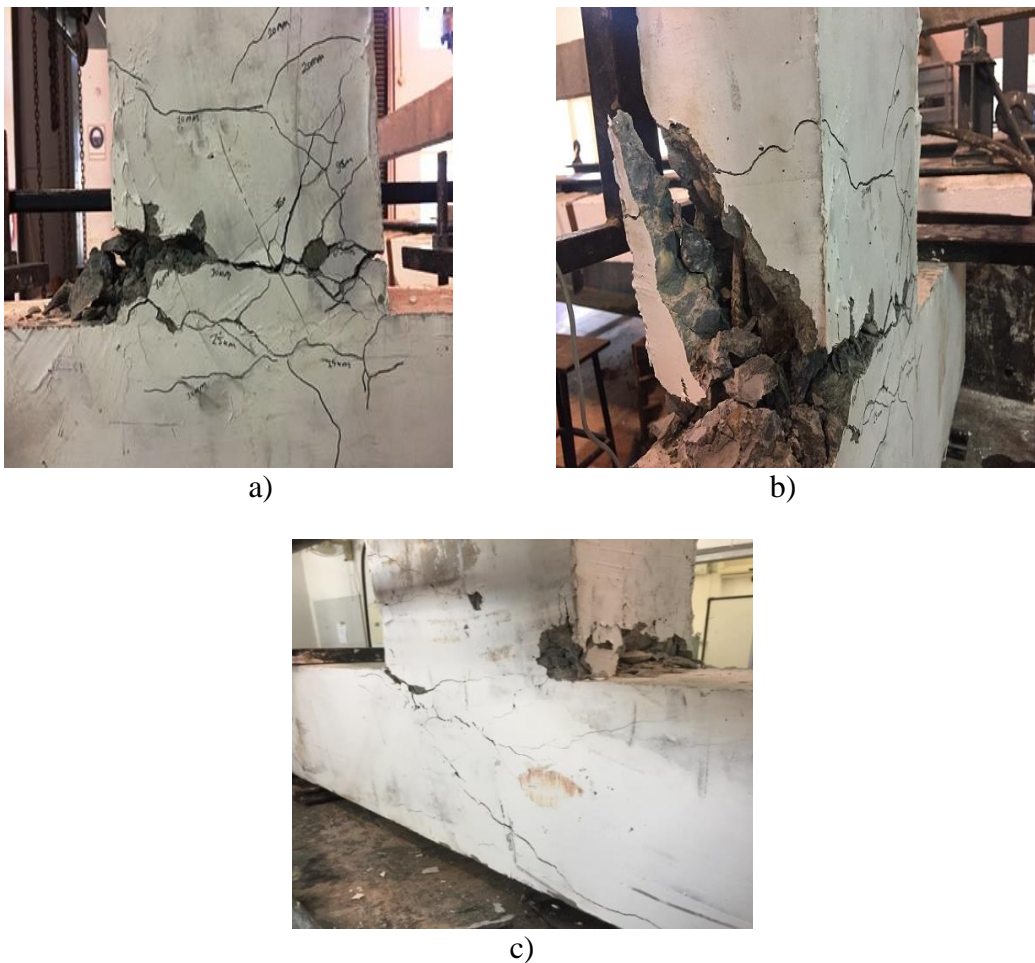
23 Crack and Failure Pattern of Control Specimen
